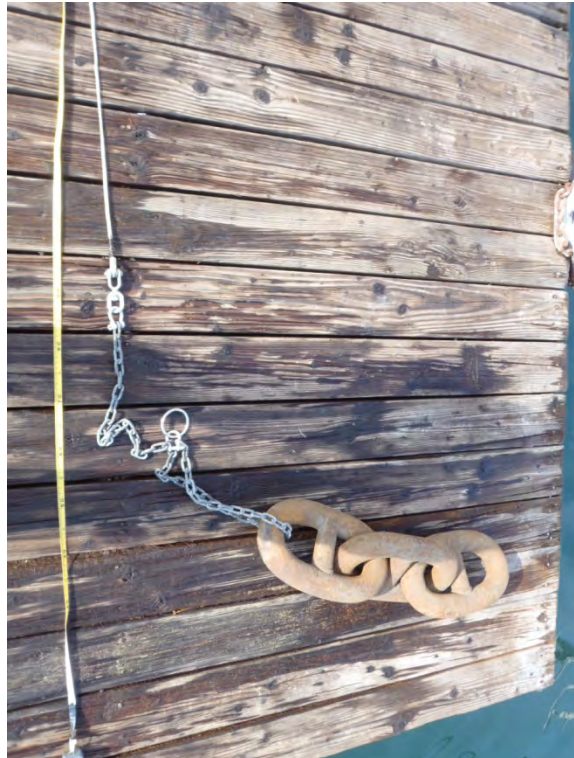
FH-01, top to bottom of mooring assembly – anchor
